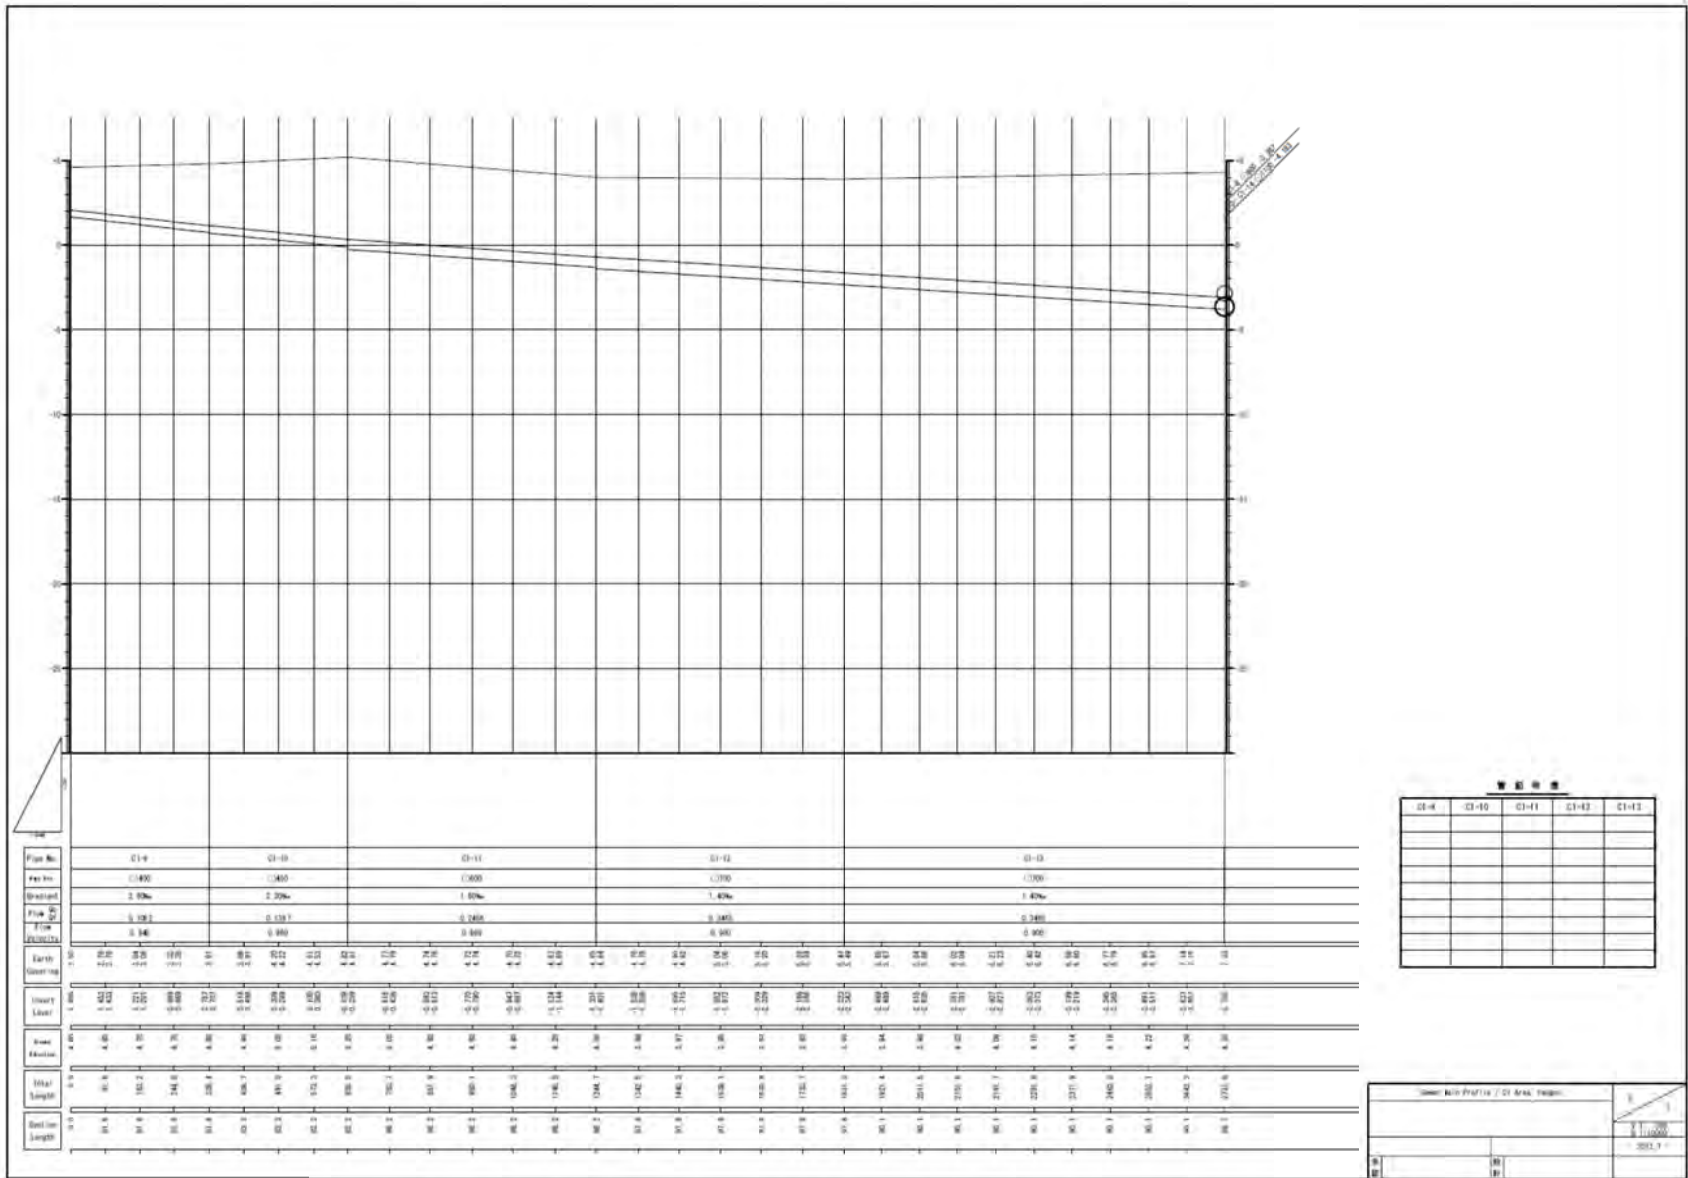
Typical Drawing of Branch Sewer and House Connection in C1 Sewerage Zone
